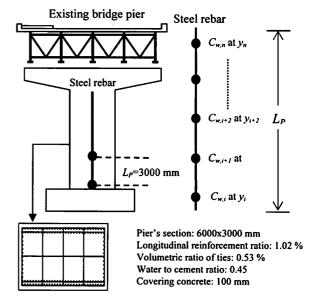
Analyzed RC bridge pier and positions of inspection
